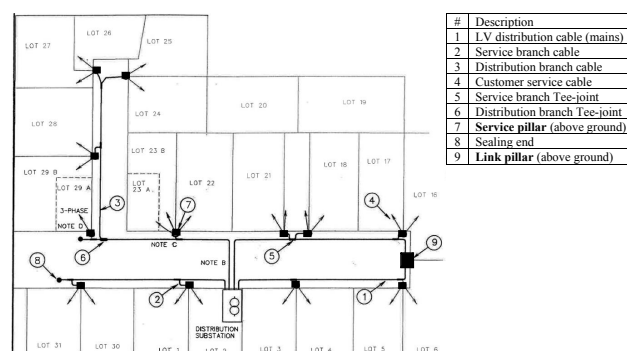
Typical layout of traditional LV "underground" reticulation in New Zealand urban areas
